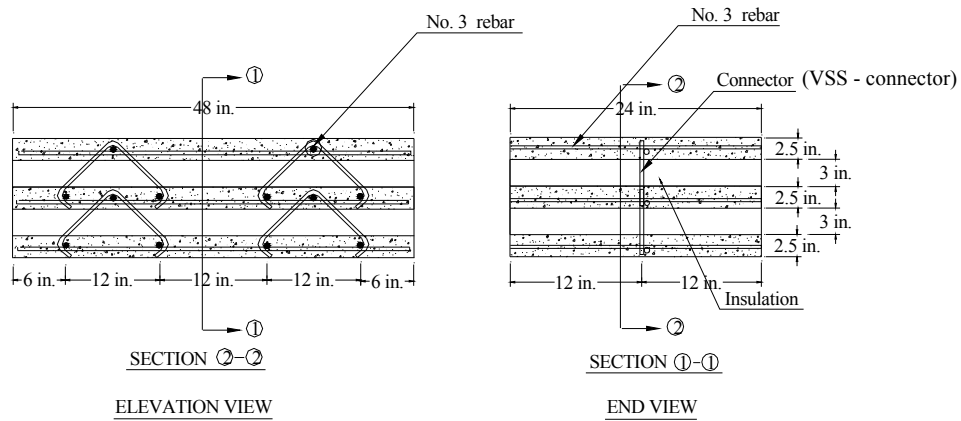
Details of 2ft. by 4 ft. by 13.5-inch push-off specimens, NU-Tie-V3 connectors
